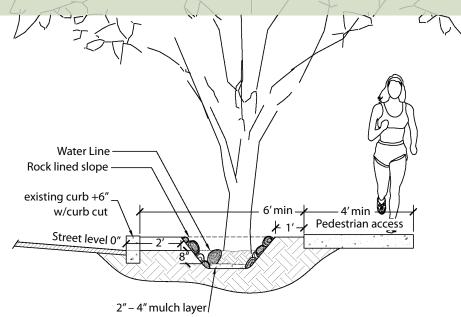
Section A. Typical cross-section of a basin with rock-lined edges, showing typical setbacks for a site on a residential street with on-street parking. For plan view, see Appendix.
